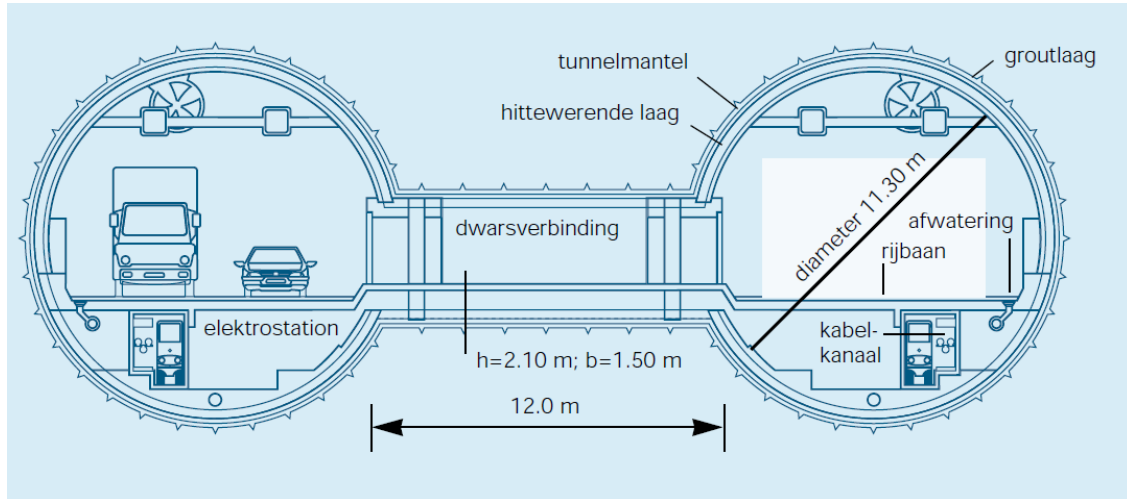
Cross section of the two tunnel tubes and the cross passage in between
